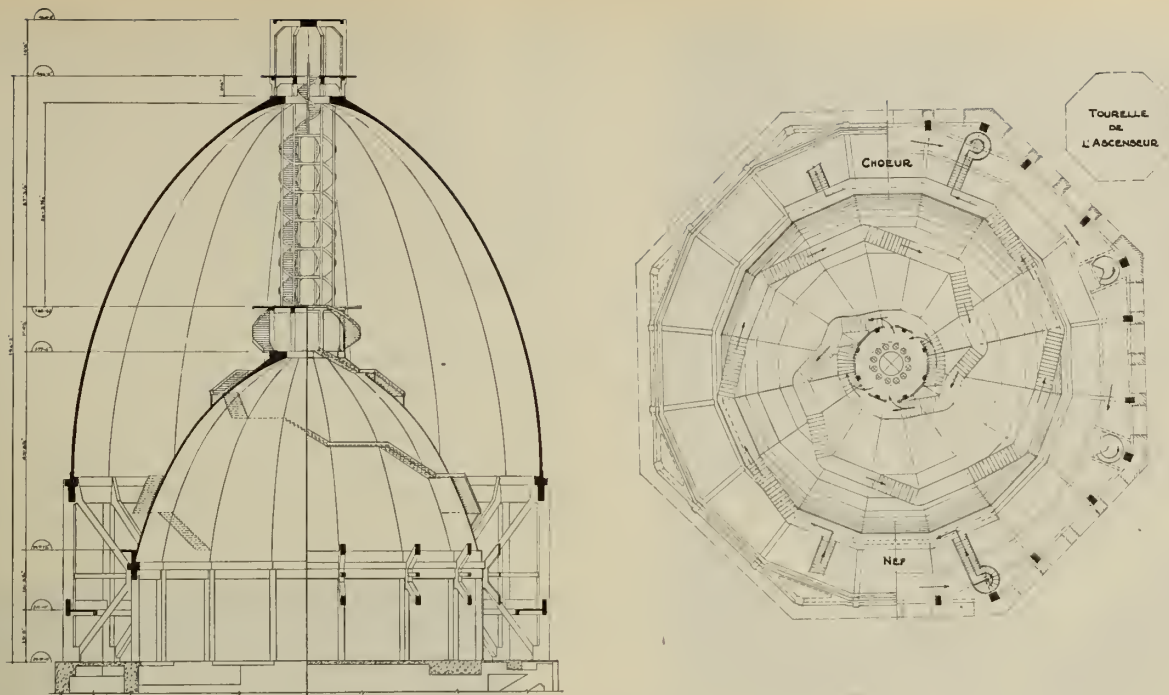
General Section of the Domes also Showing Future Arrangement of Stairways Leading to the Observation Lantern
